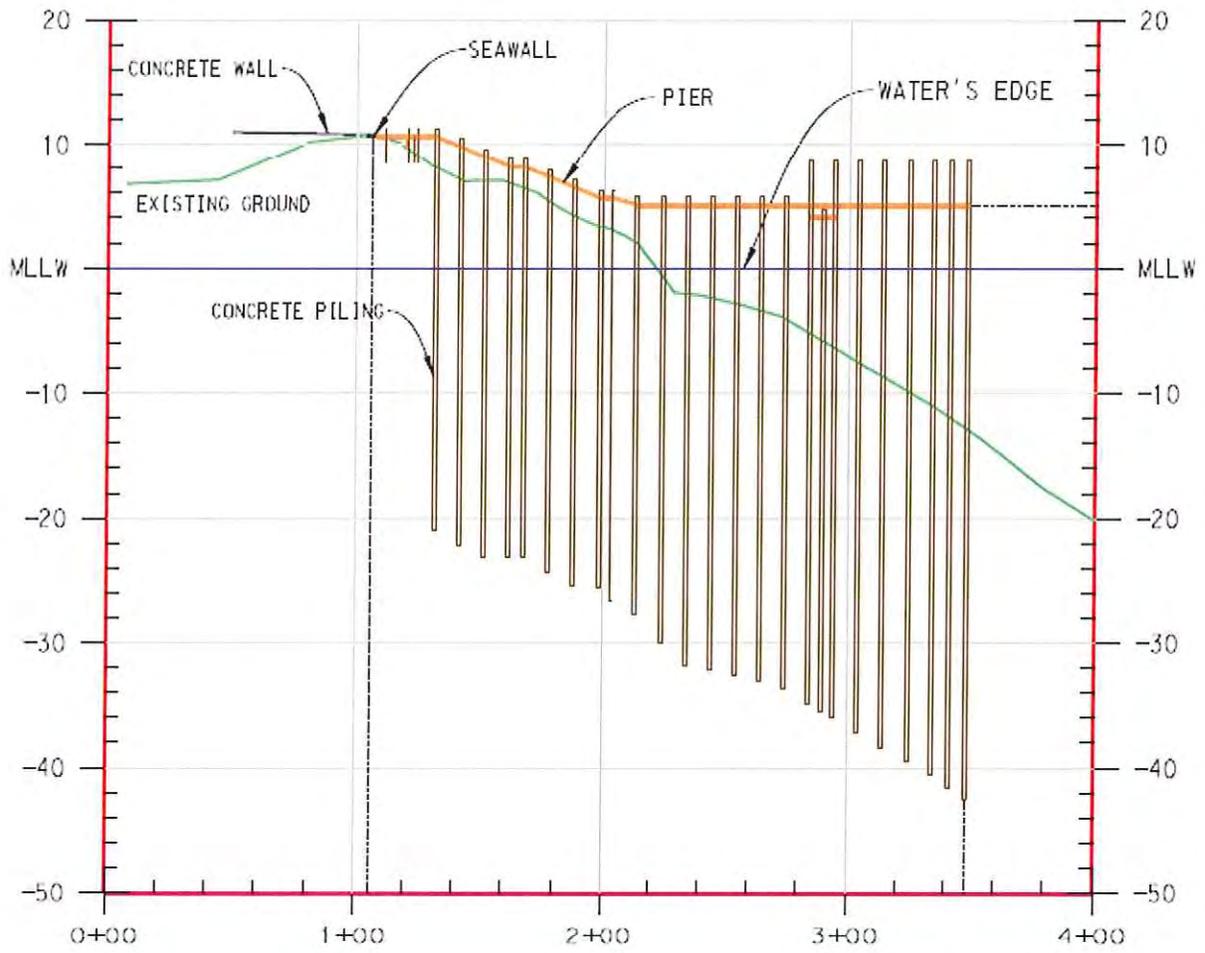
Profile View of Fort Pickens Ferry Pier Location.
